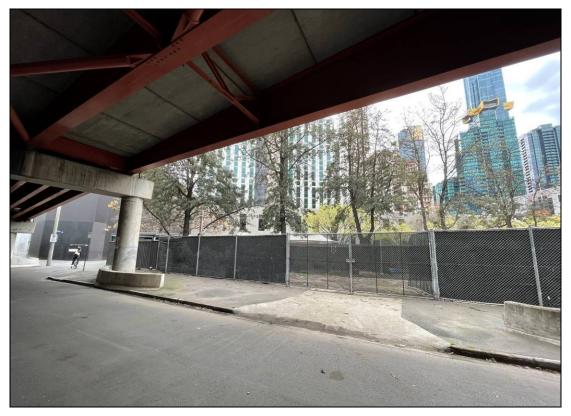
Photo of site from Kings Way Undercroft. Captured 19 September 2021
